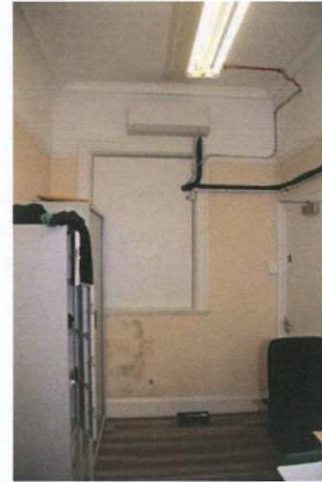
F-8 – View to west; blind window formerly overlooking lightwell
